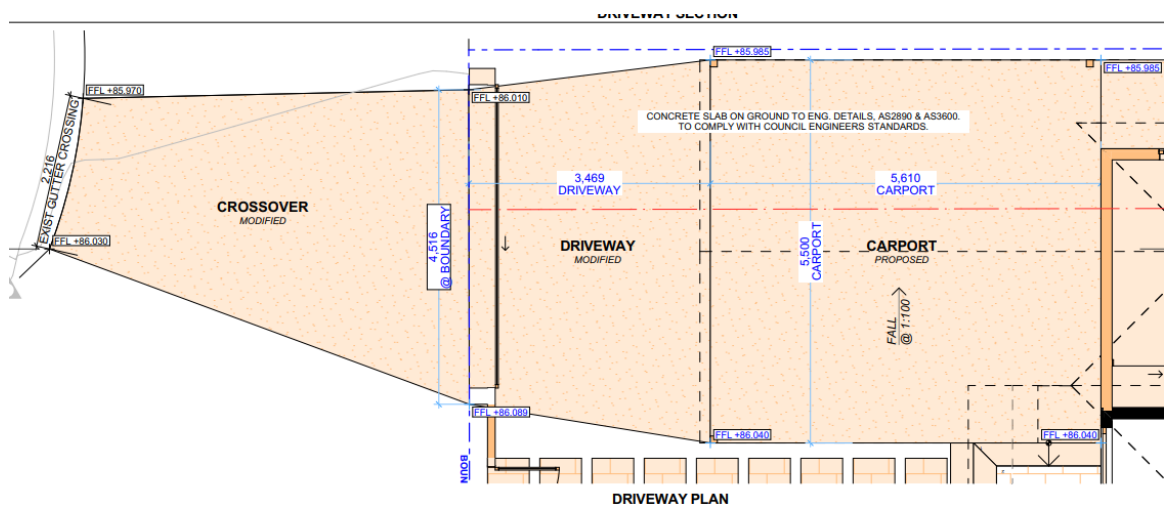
Extract from Architectural Drawing DA12 Driveway Plan, showing proposed driveway and double carport dimensions
